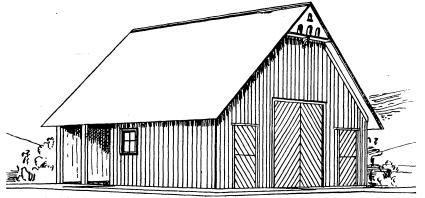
Perspective view of \$450 barn. (Design No. 1.)
